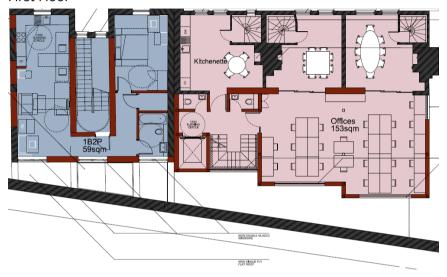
Sclater Street Proposals – Basement and Upper Floor Plans - Victorian Building and Weavers Cottages
